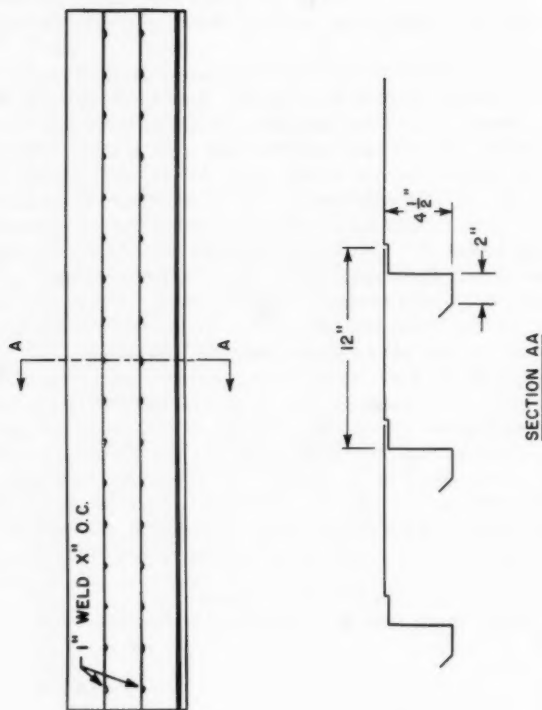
DECK SECTION AND WELD PATTERN
